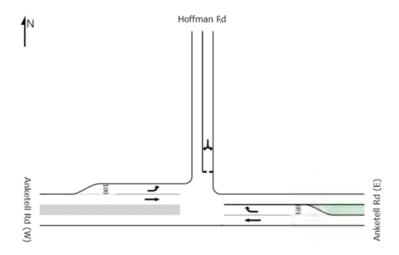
Upgraded Anketell Road/ Hoffman Road intersection layout in SIDRA
